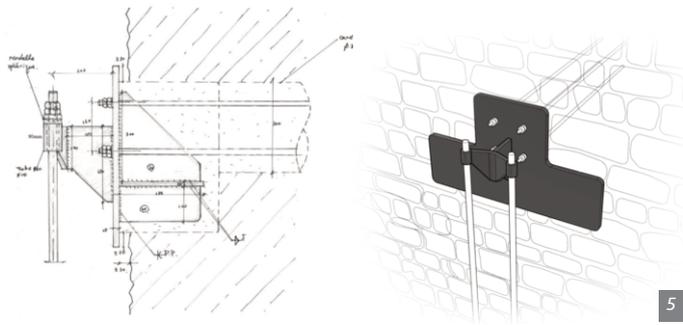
Anchor detail on the exterior side of the façade © Ney & Partners
